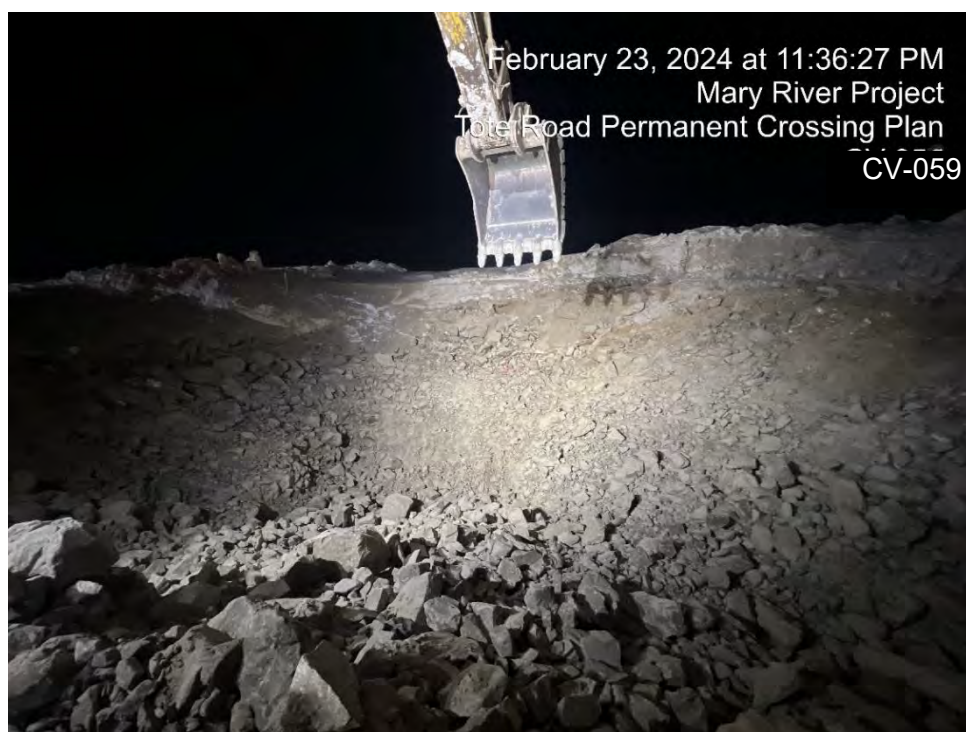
CV-059 looking east at the blasting excavation from the centre of the culvert (February 23, 2024)
